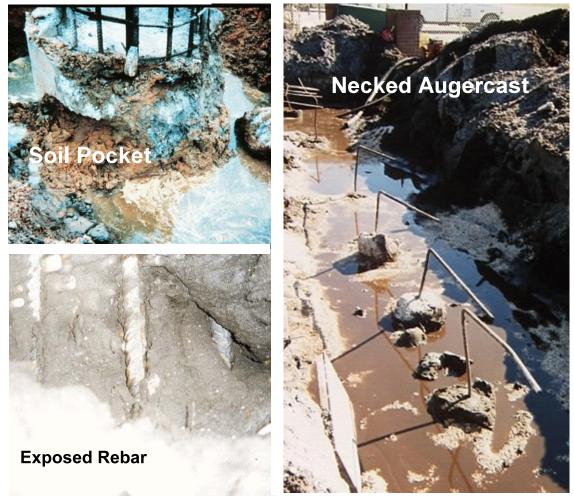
Soil Inclusions, Exposed Rebar, and Necking Found Near Water Table.
